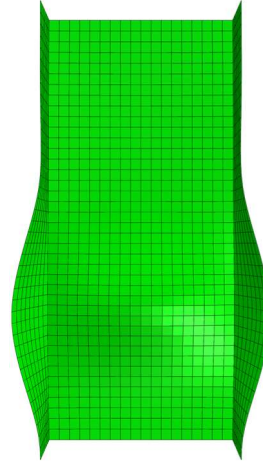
Test and FE failure modes for typical stub column specimens.
